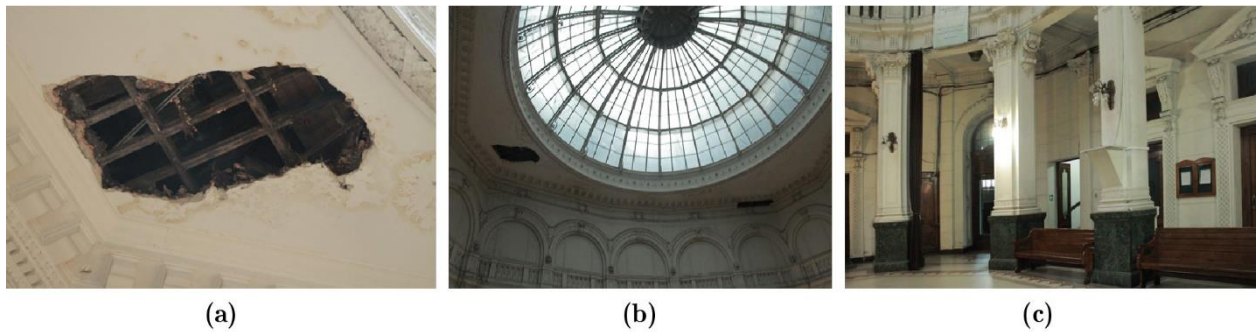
Typical mixed iron-reinforced concrete building (Bolsa de Valores de Valparaíso): (a-b) roof and dome damages and (c) interior columns
